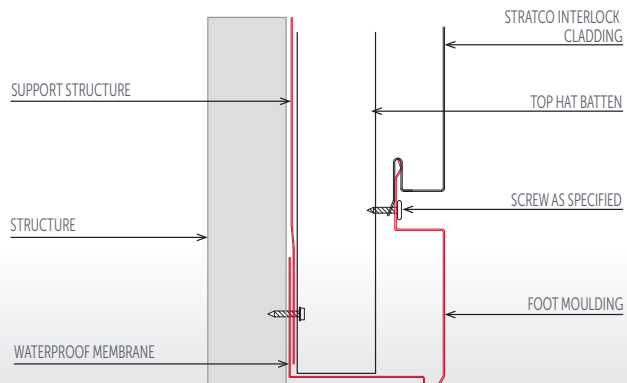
BOTTOM OF FACADE MOULDING DETAIL
